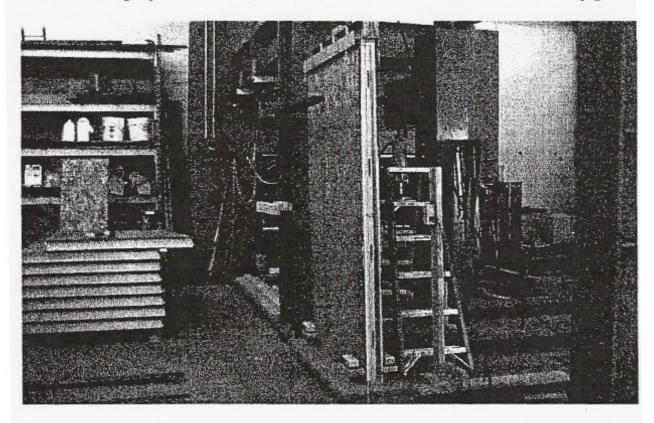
Test Setup for Compressive Loading on 8' OSB-OSB Panel
